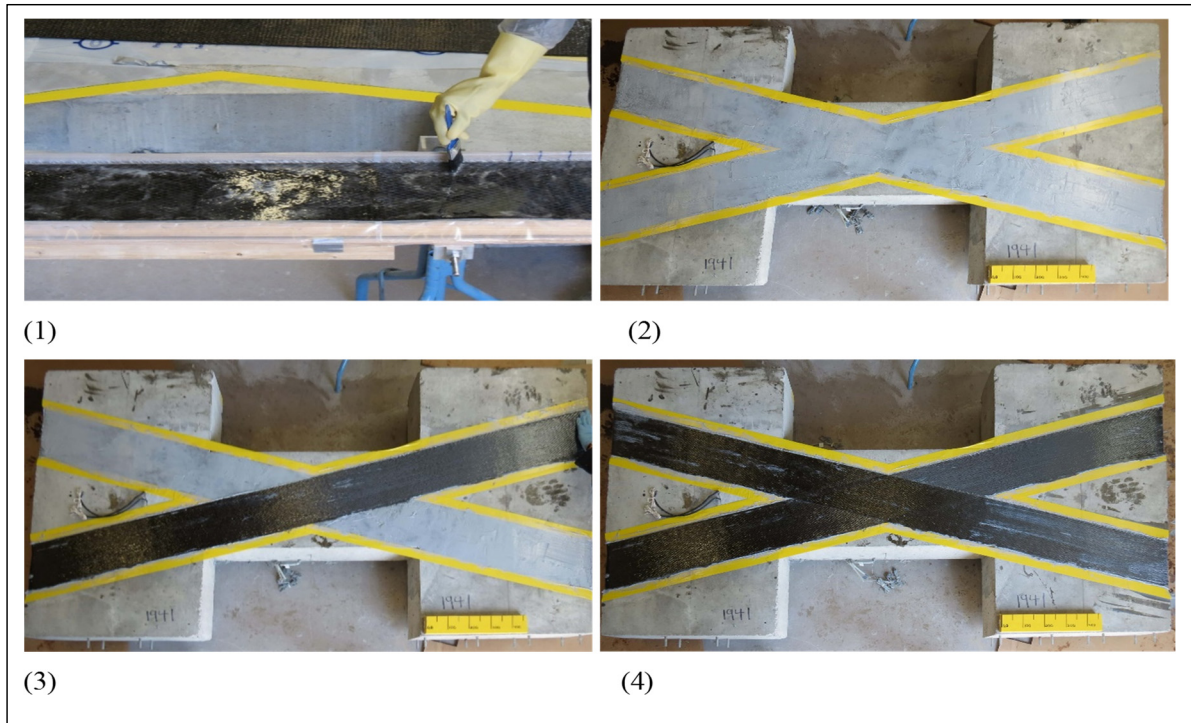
Strengthening procedure for the CB specimen: (1) Impregnation of fibers with Sikadur 300, (2) Coating the concrete surface with Sikadur 300, (3) Bonding the first strip of CFRP onto one diagonal, (4) Bonding the second strip of CFRP to another diagonal
